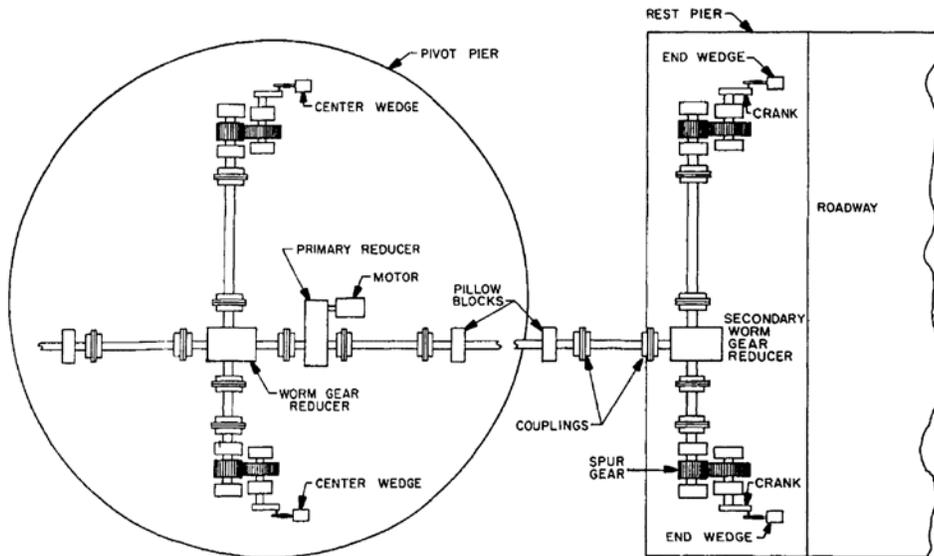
Wedge drive machinery
